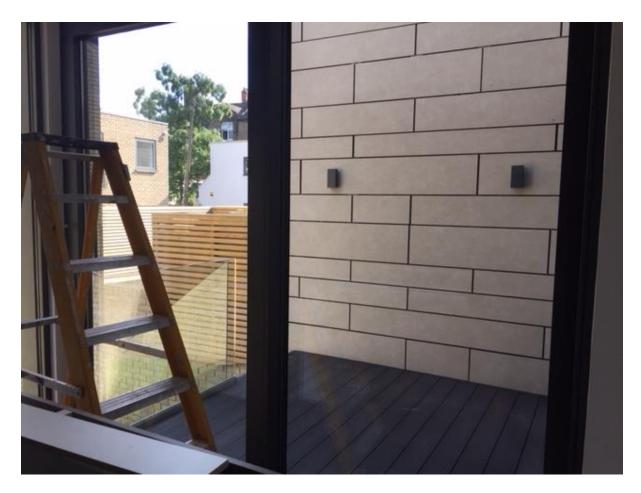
View from kitchen looking over existing terrace with the new Studio apartments and College Lane in the background.
